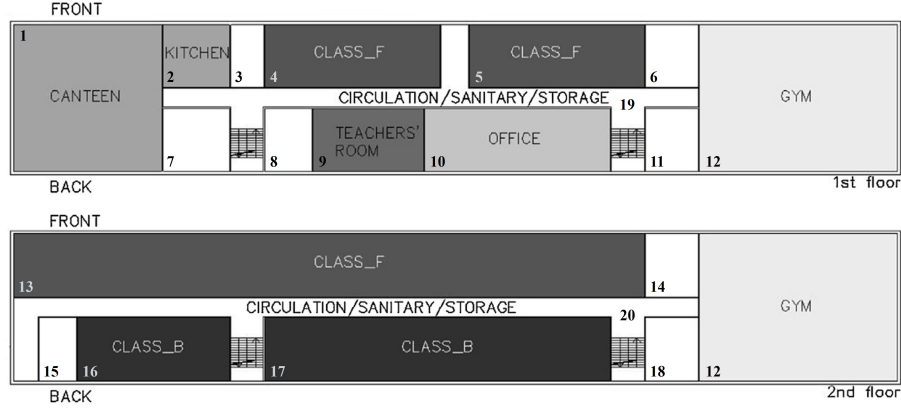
Floor plan of the representational Flemish school building model [37].
